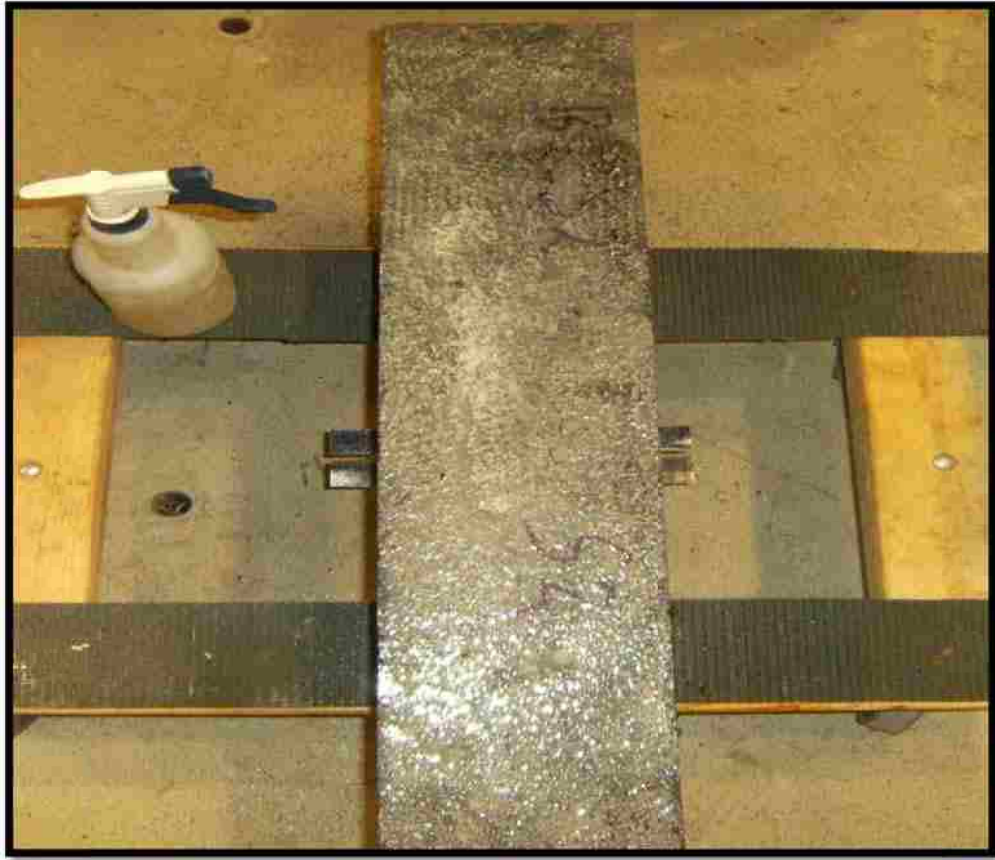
The attachment of knives to specimen with the super glue, and keeping of the specimen wet by water spray
